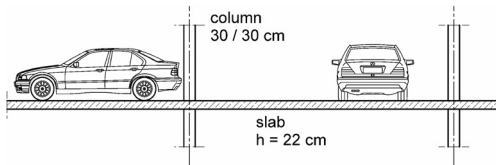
Regarded reinforced concrete slab in a multi-storey car park.
